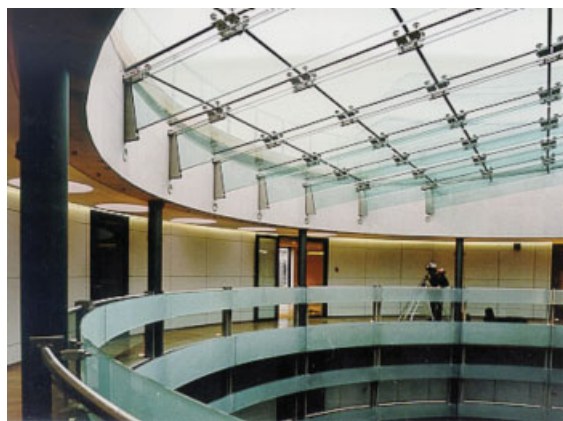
Glass atrium at the top floor of the building at 53–55 Av. Georges V (Paris). The glass roof is supported by tempered and laminated glass beams. These have $2 \times 19 \text{ mm}^2$ sections, the larger side being set
